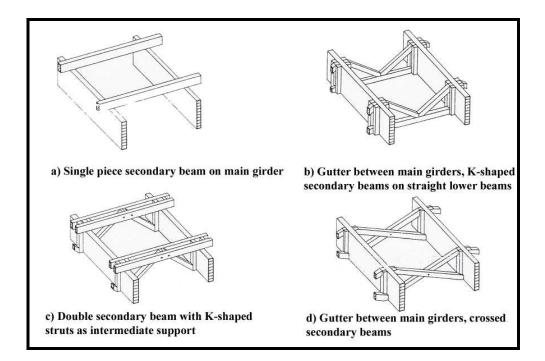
Secondary girders are placed on main girders in various alternatives with 90° (Götz *et al.*, 1989:109).
